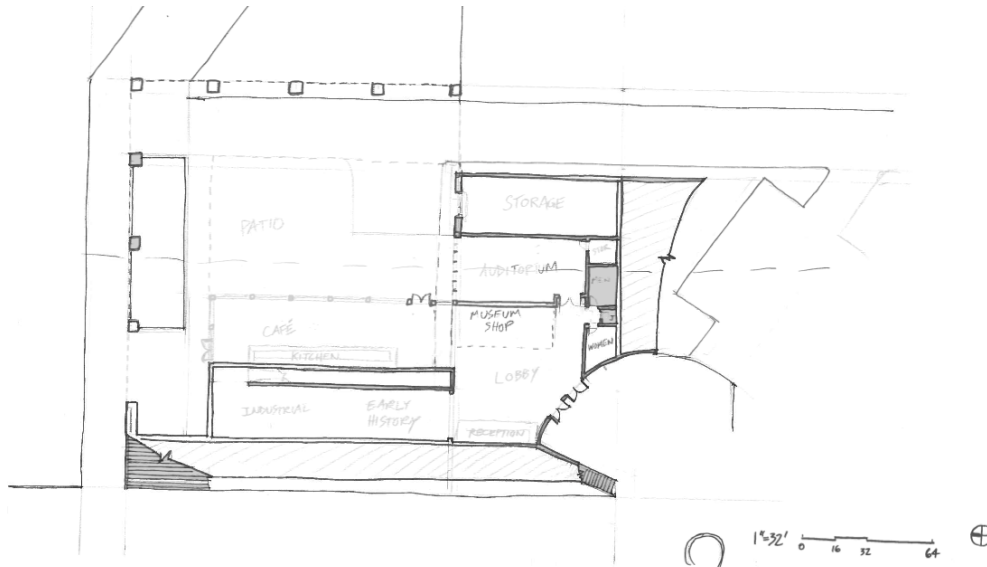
First floor plan, “Rising Volume” scheme, image by author.
